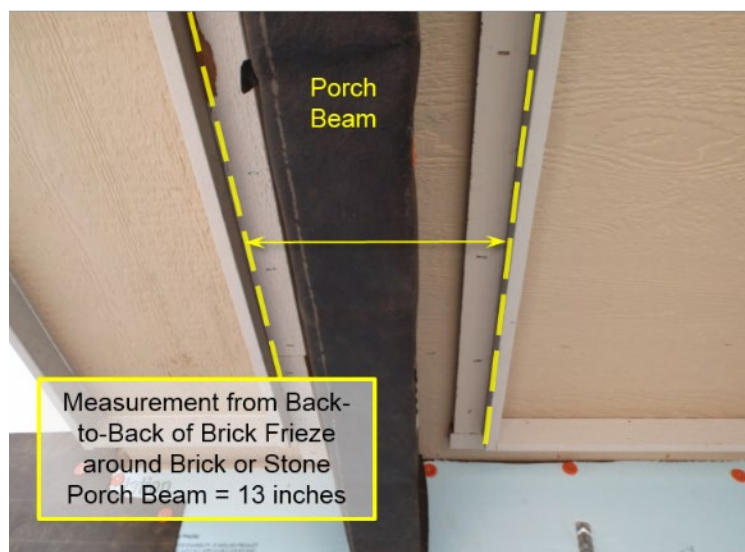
Brick Frieze around Porch Beam Covered with Brick or Stone
